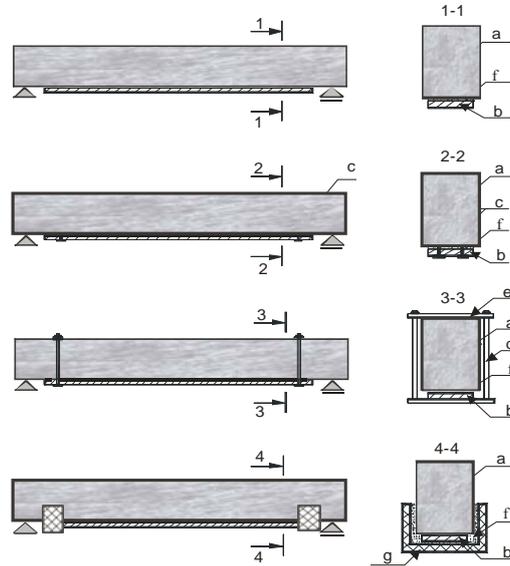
Strengthening of RC beams with FRP soffit plates *a* – concrete; *b* – FRP plate; *c* – anchor bolts; *d*, *e* – elements of the metallic jig; *f* – adhesive layer.
